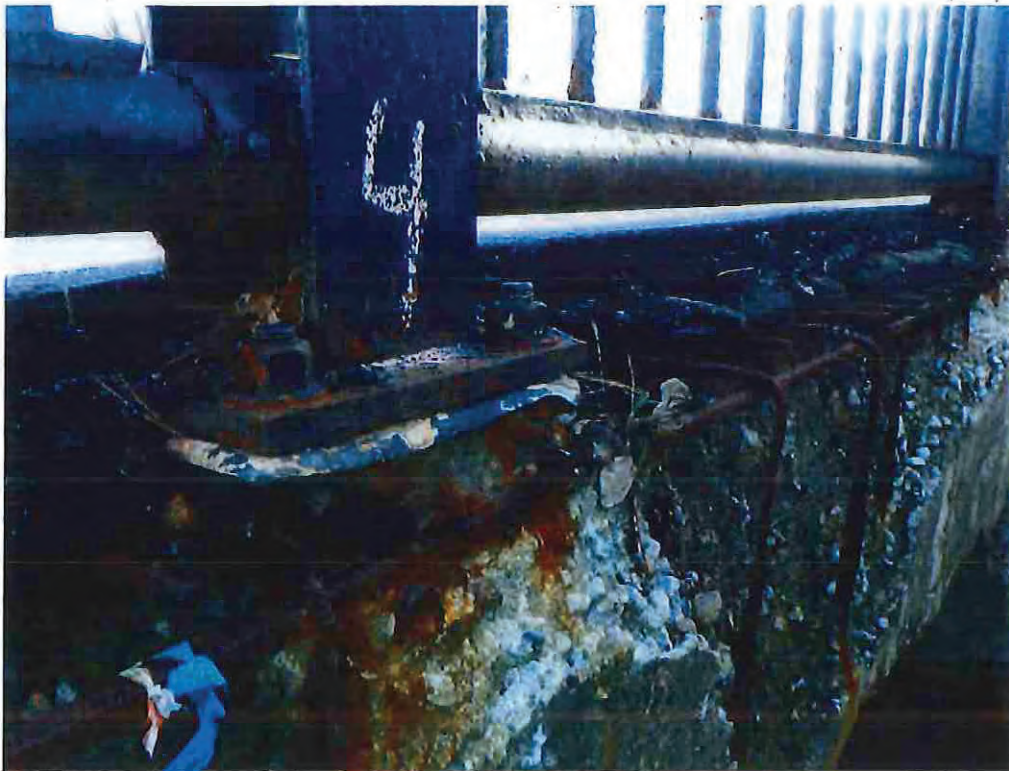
Span 2, east concrete slab at the north abutment has a spall with exposed rebar measuring: 2' L x 1' W x 2" D.
